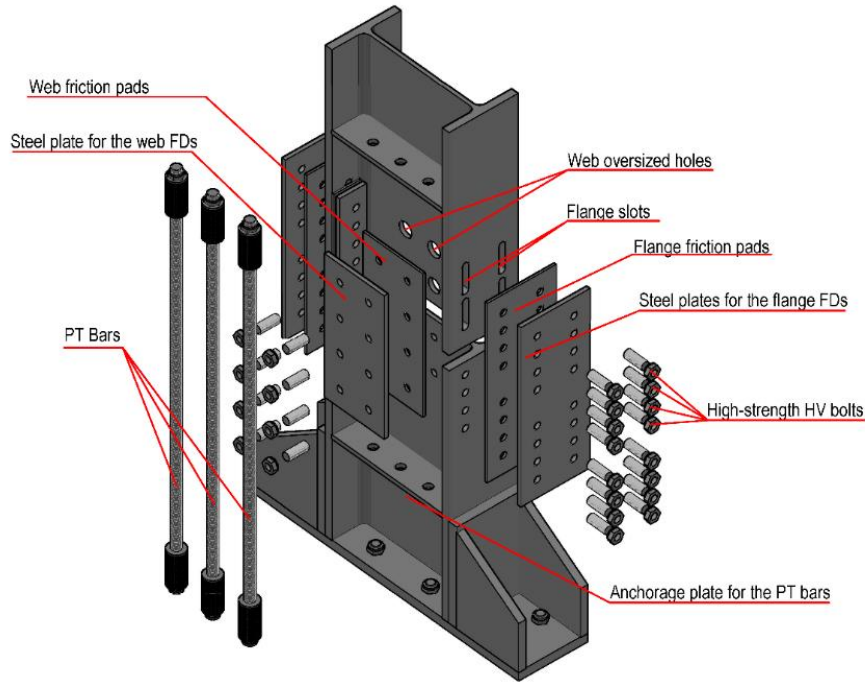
3D exploded view of the SC-CB connection developed by Latour *et al.* [19].
